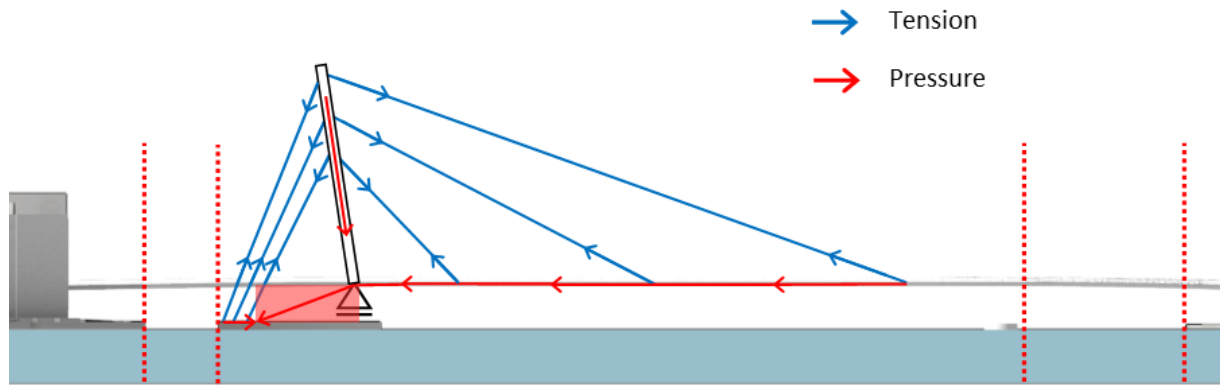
Diagram showing the flow of forces through the bridge. The red rectangle resembles the construction required to divert horizontal forces from the deck to the foundation
